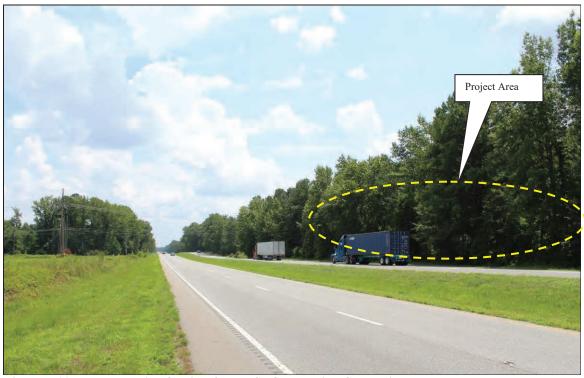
Photo location 8- View from US-58 bordering Chambliss House property towards project area (not visible) showing existing transmission line (not included in this rebuild project), facing east.
